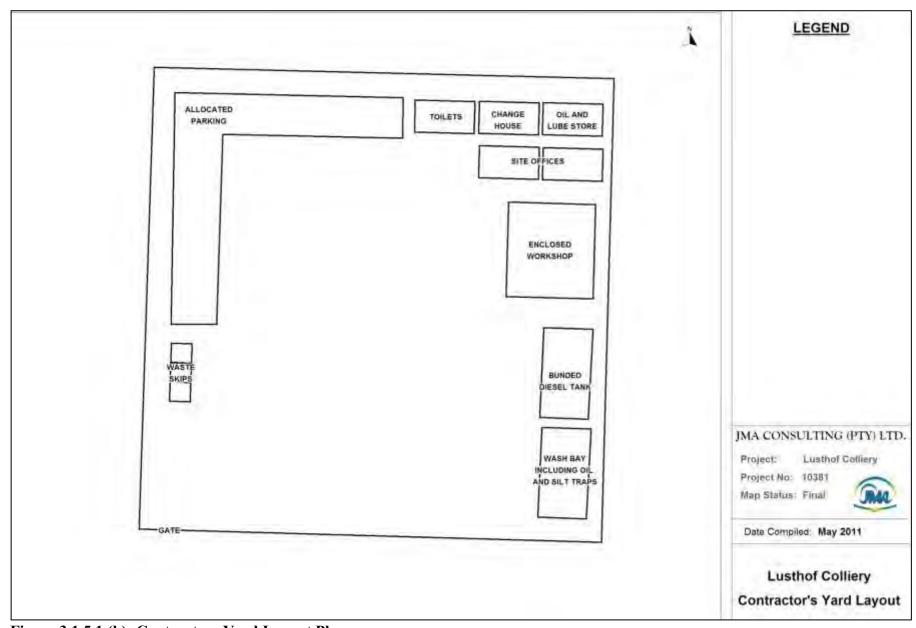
(b): Contractors Yard Layout Plan.
